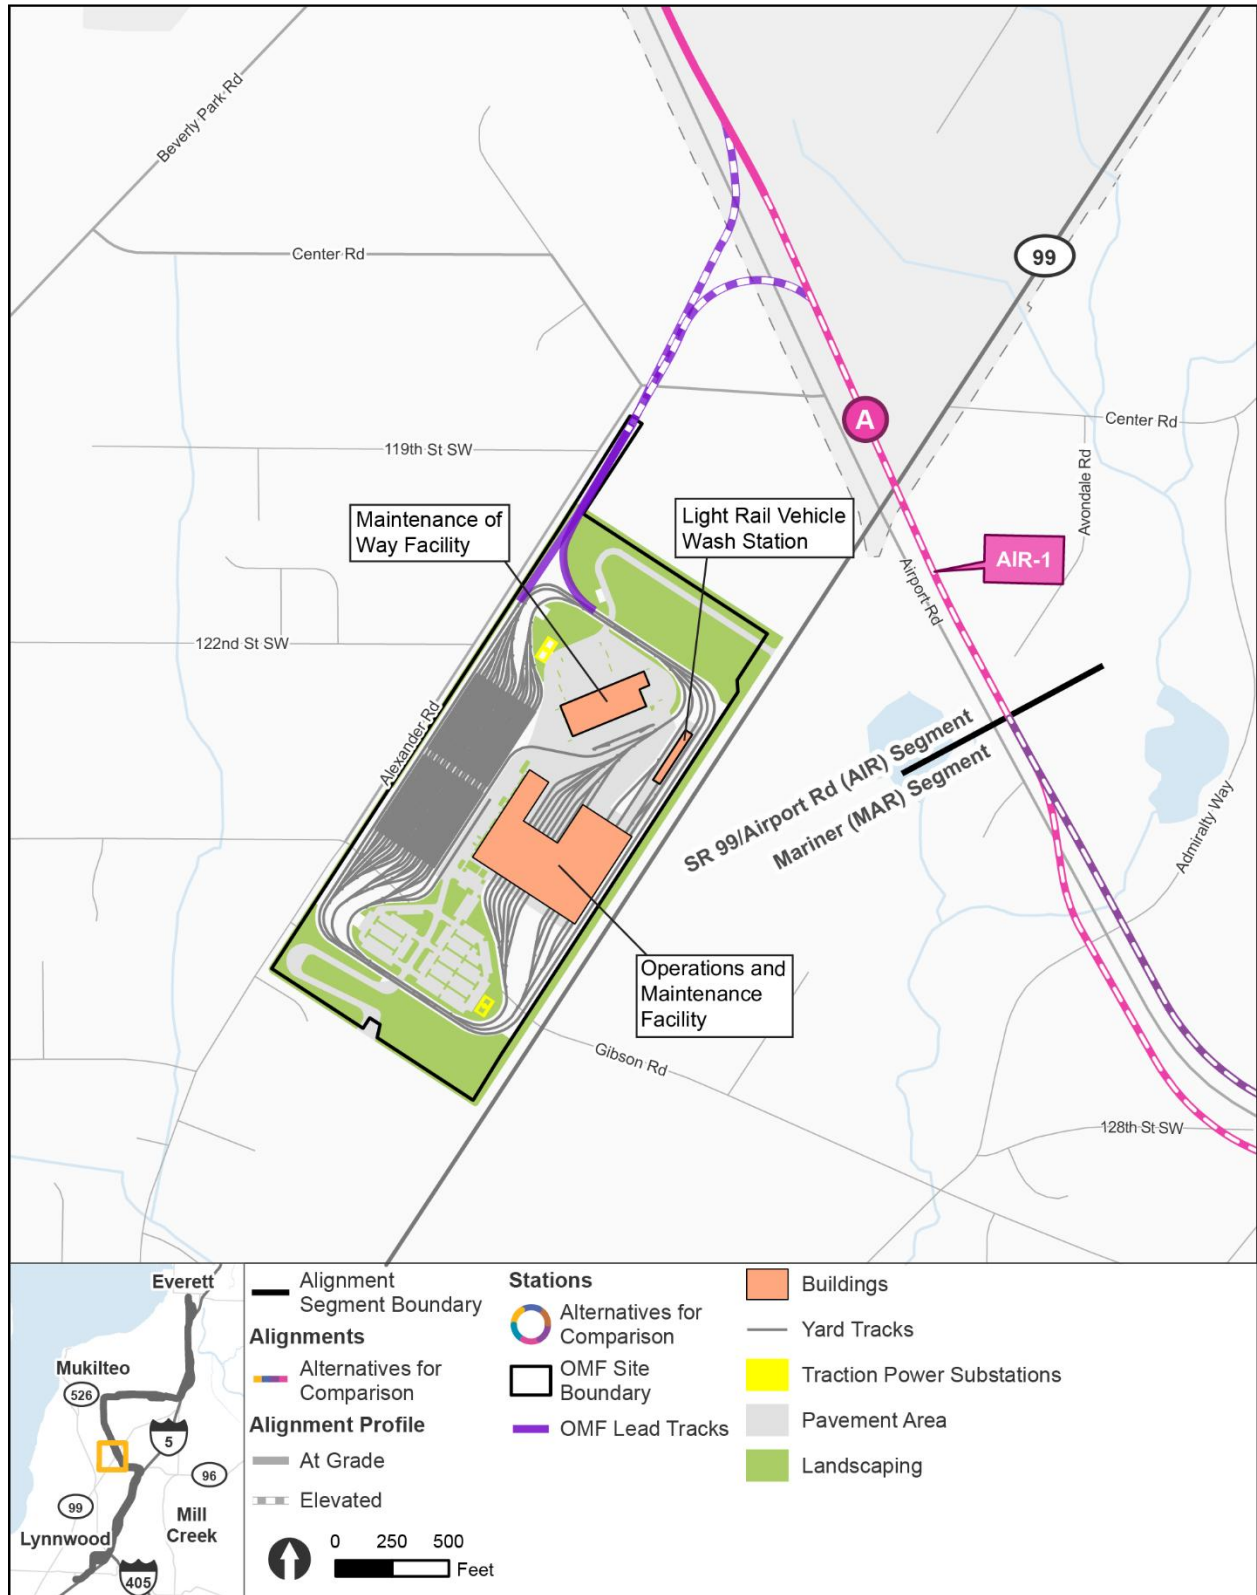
OMF Site F with Lead Tracks to West Side of Airport Road
